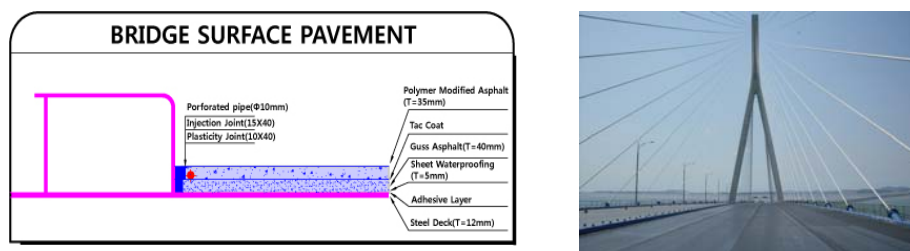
Cross-section of the pavement on the cable-stayed deck
